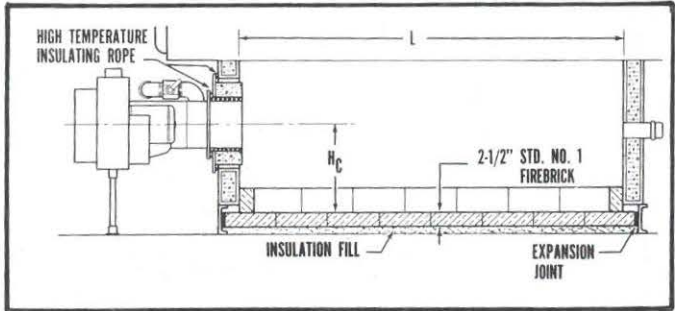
TYPE "FL" BURNER INSTALLATION FIRING FIREBOX BOILER THROUGH THE DOOR
